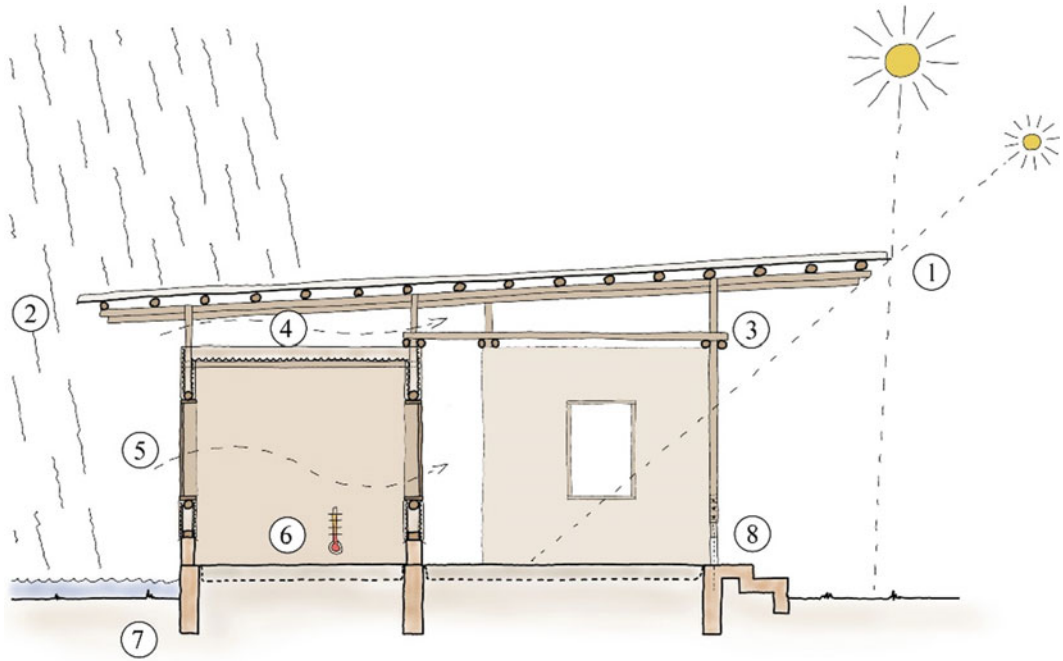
Characteristics of the proposed hybrid construction: canopy to protect from the sun, especially during the summer months (1), canopy to protect against rain (2), low building height, light roof, and bamboo construction for earthquake protection (3), lifted roof to promote ventilation and reduce radiation (4), perforated walls and
